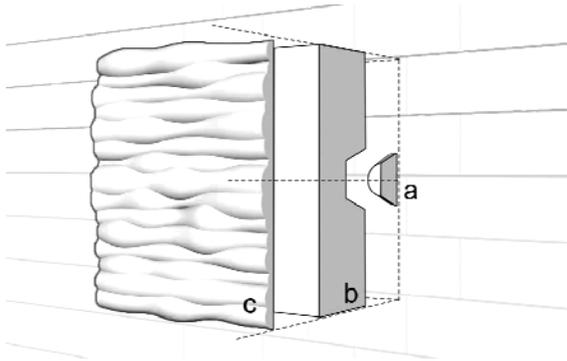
Mono-material insulation system onto bare wall element: anchor (a), insulation (b), designed surface finish (c)
